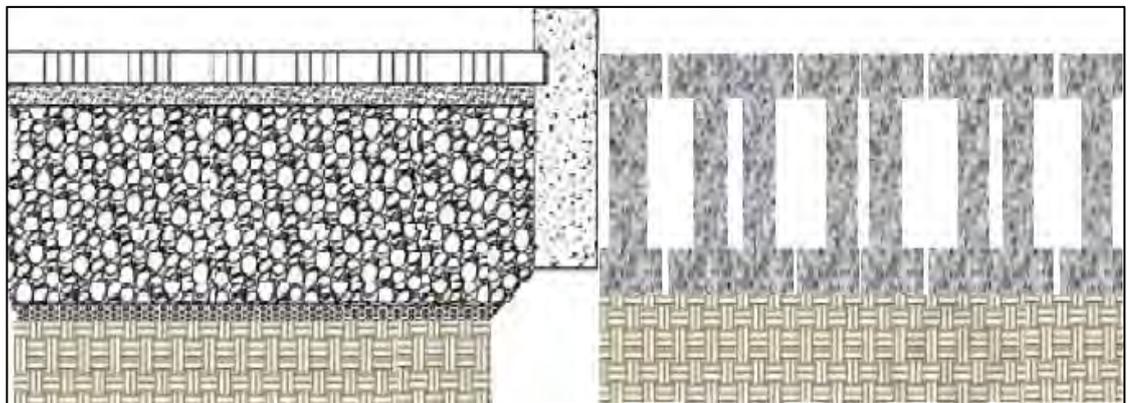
Cross-section of, (a) typical PICP pavement structure, and (b) new green pavement design, permeable pavement with micro detention storage (PPDS)
